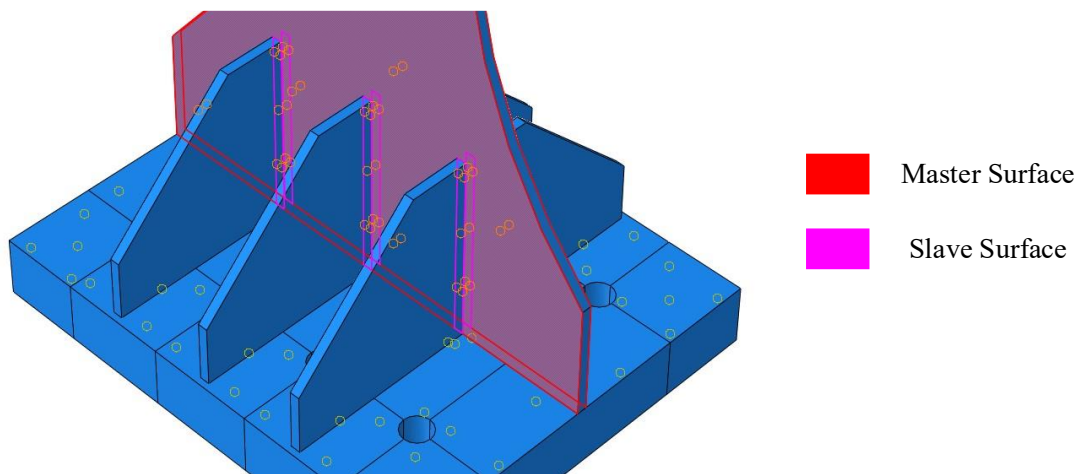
Tie constraint between connection stiffeners and main test plate.
